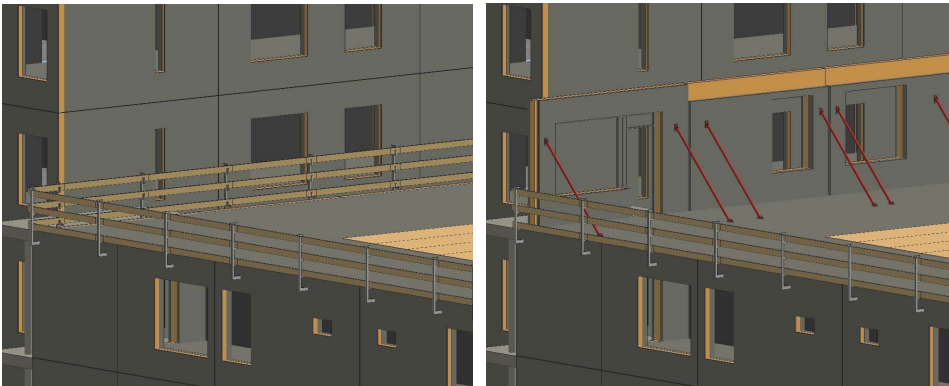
Model-based falling prevention planning related to precast unit construction (Sulankivi et al. 2009b).
